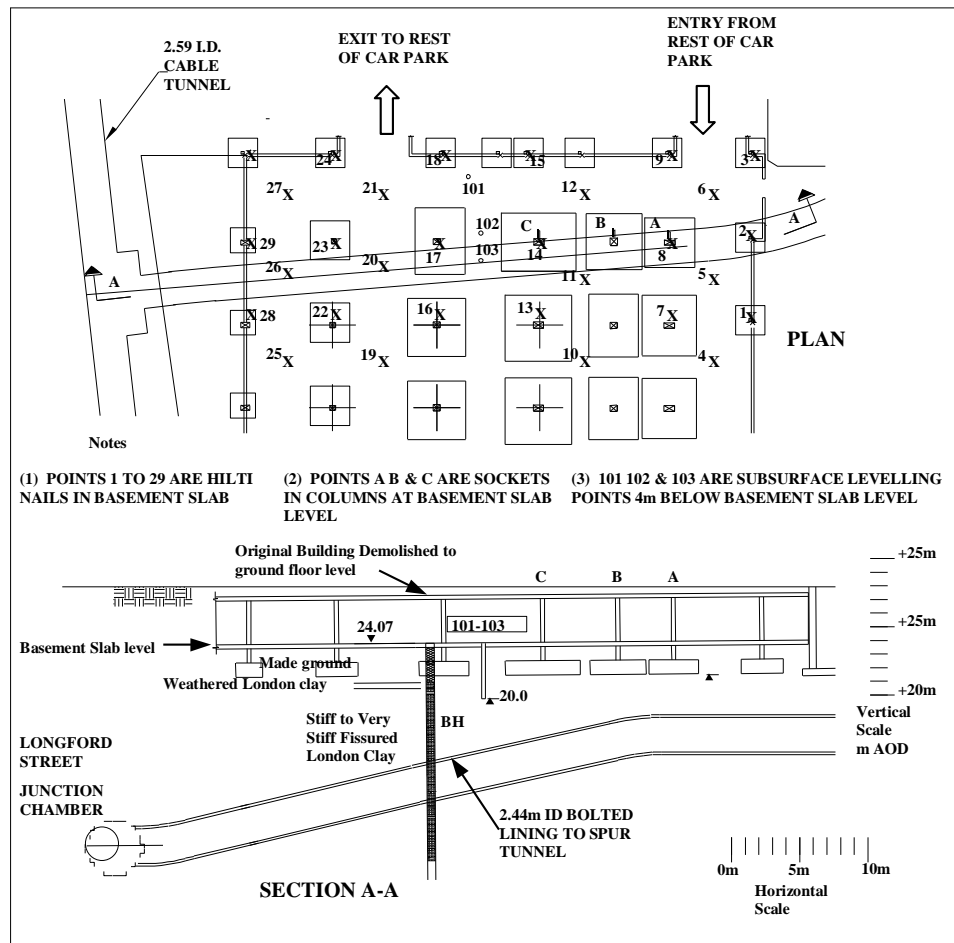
Plan and Section of Longford Street Spur Tunnel.
